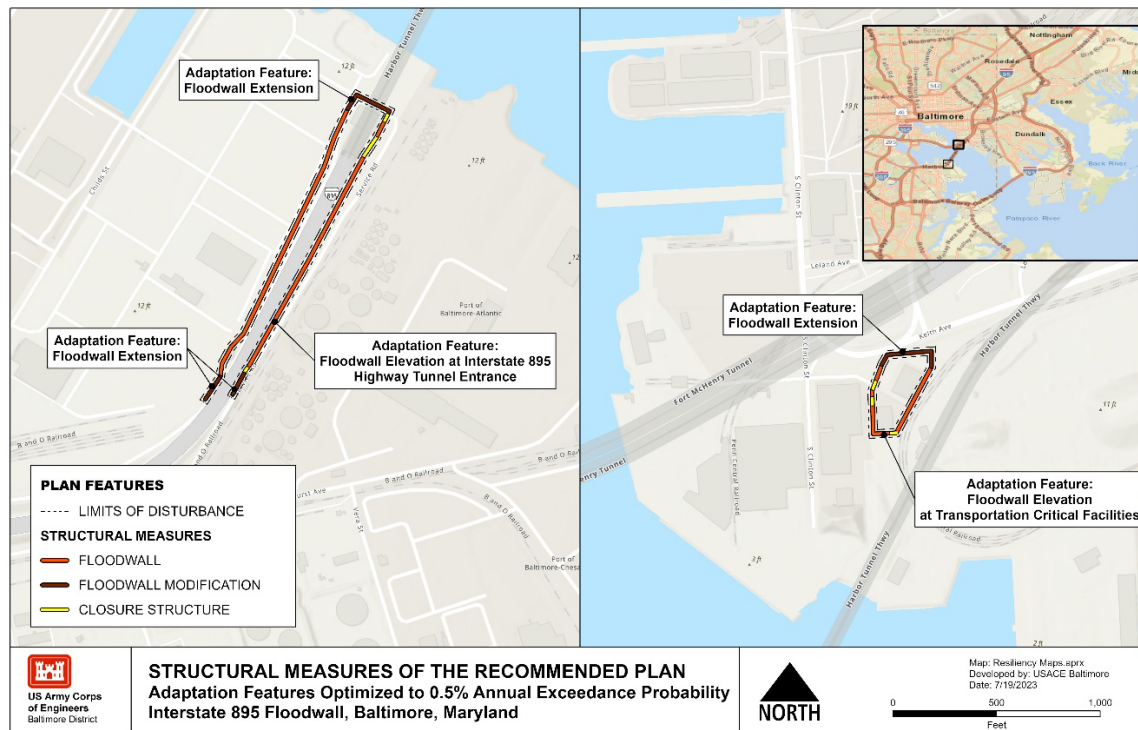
Structural Measures of the Recommended Plan at the I-895 Tunnel Optimized to 0.5% AEP
